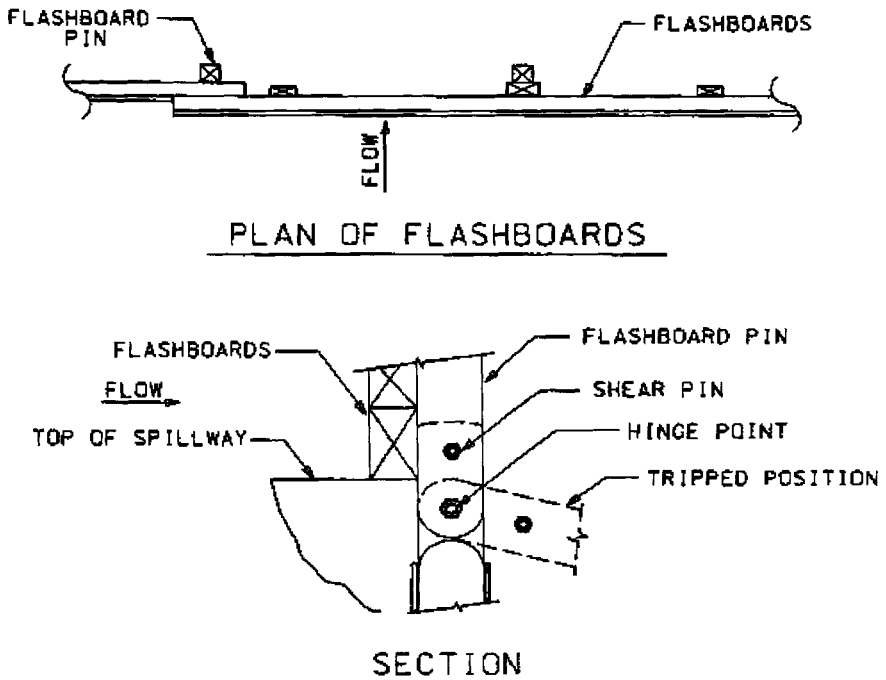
Plan and Section Showing Shear Pin Trippable Flashboard System
